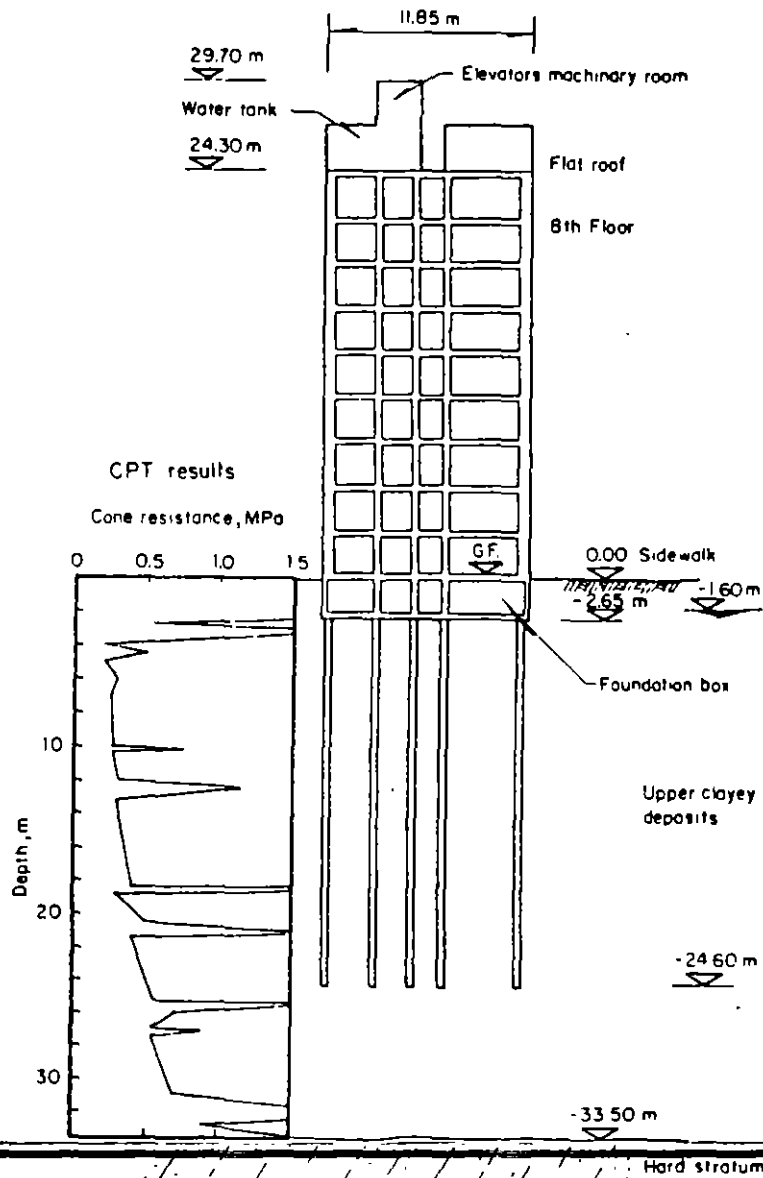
Elevation of the Building V including foundation and geotechnical conditions.
